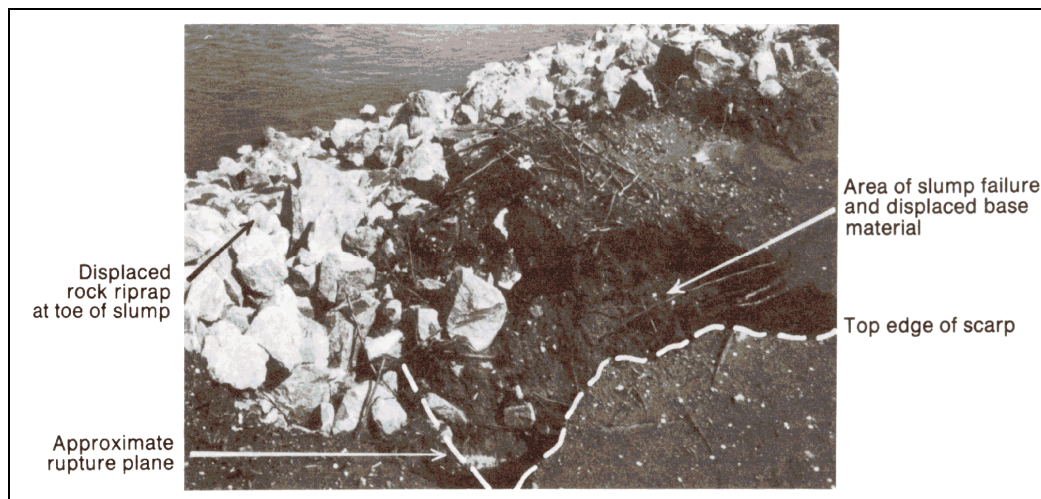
Riprap on left bank Cosumnes River at Site 1 near Sloughouse, CA, showing slump failure (photographed May 31, 1983) (Blodgett & McConaughy 1986).
